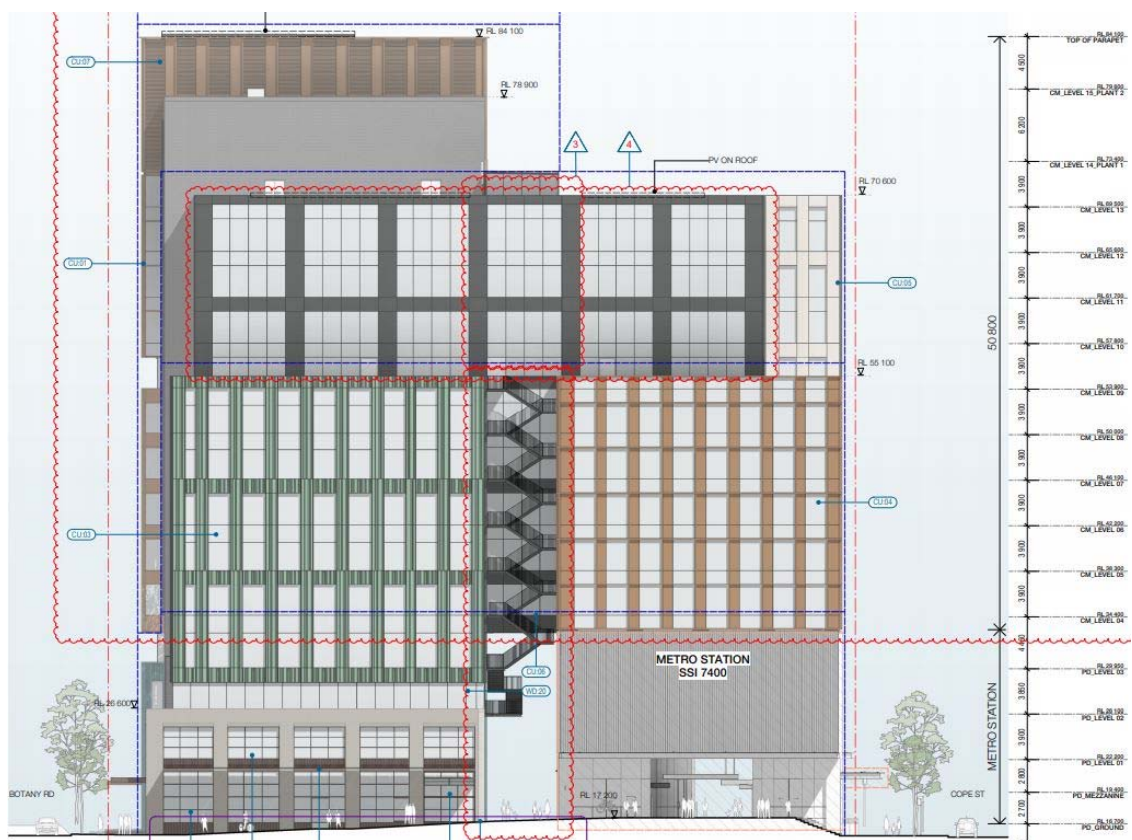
| South Elevation (towards Cope Street Plaza and Central Precinct) (source: Applicant's RtS)
